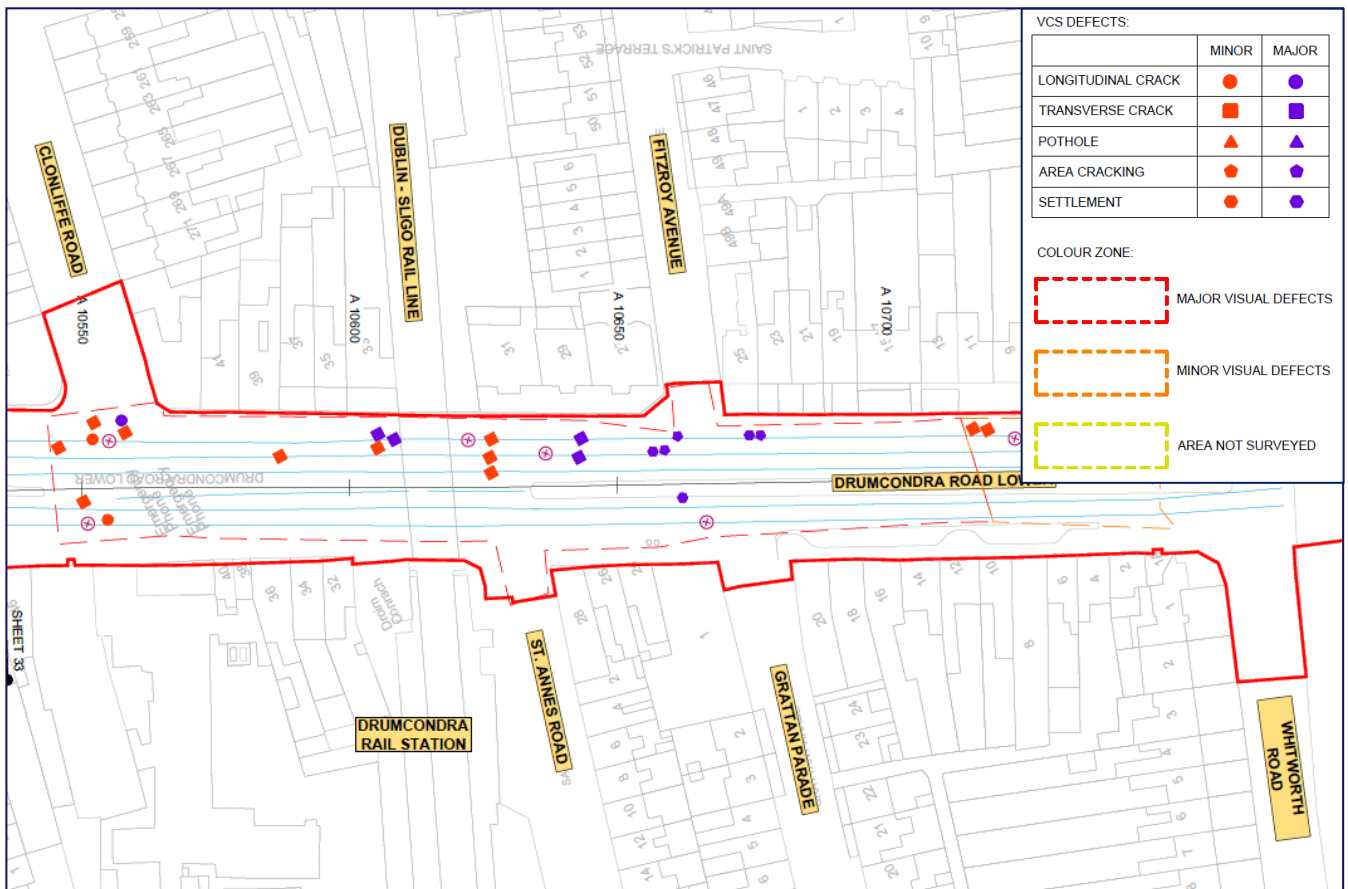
Example Ranking of Pavement Condition and the Type and Location of Defects Observed.
